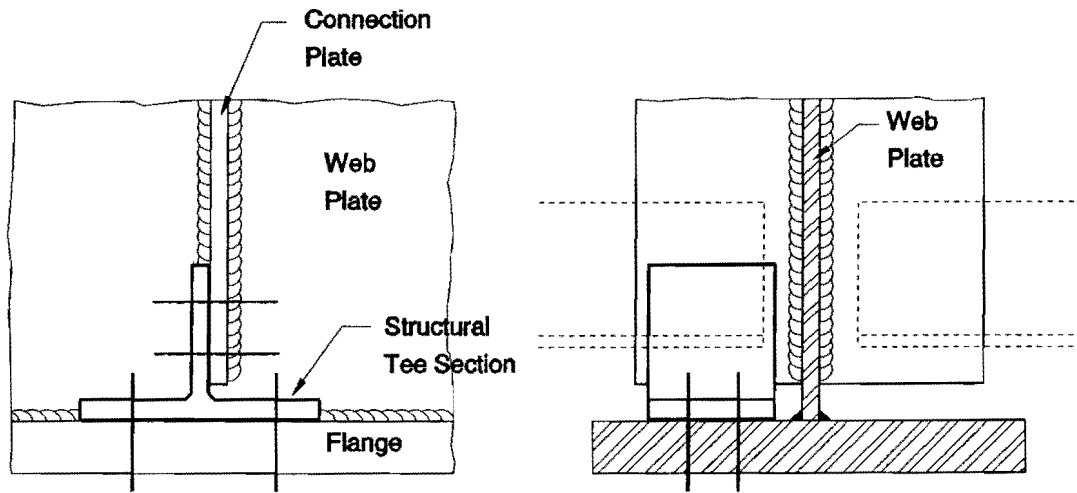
Typical bolted retrofit for cut-short connection detail.
